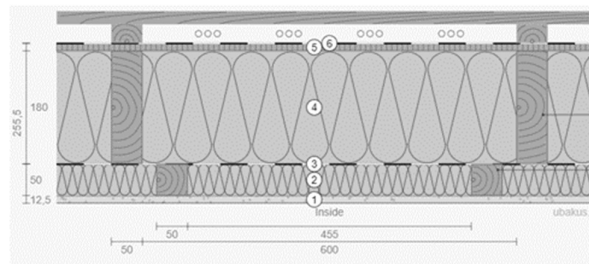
Timber frame panel construction - wall (1 - plasterboard 12.5mm; 2 – mineral wool 50 mm; 3 - vapor barrier 0.5mm; 4 - mineral wool 180 mm; 5 - OSB 12mm; 6 - windproof film)
